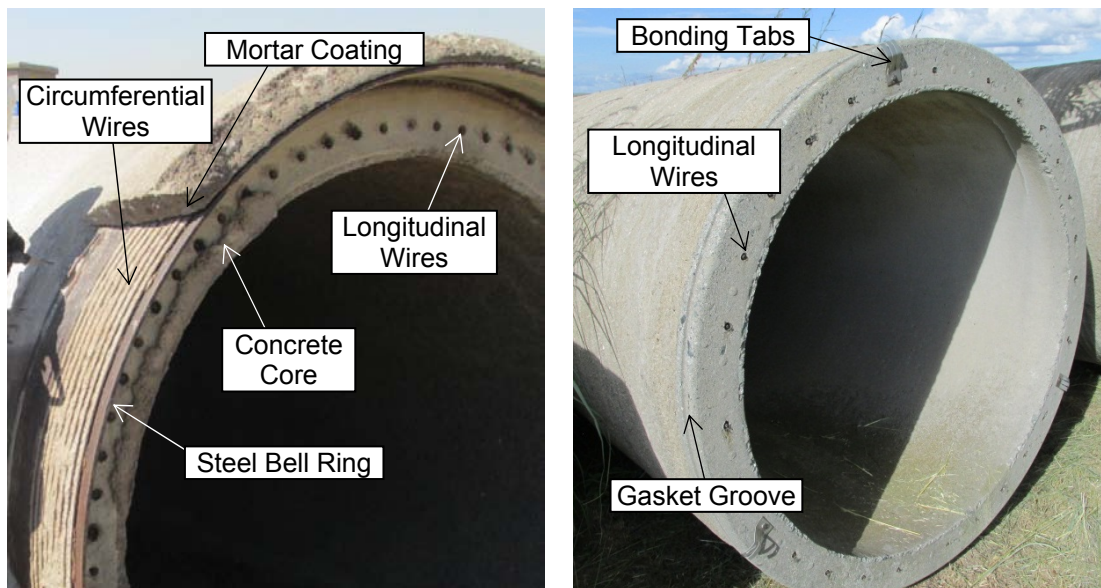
Left – Construction of PCP at Bell. Right – Construction of PCP at Spigot.
